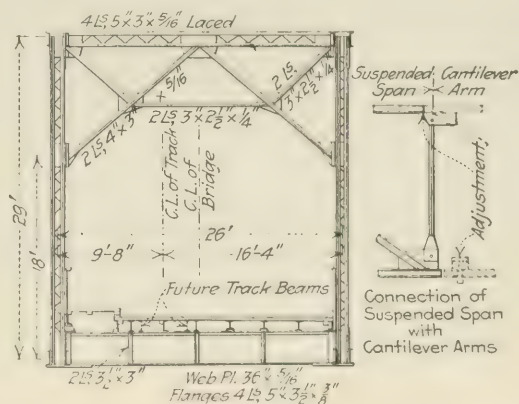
CROSS-SECTION AND DETAIL OF BRIDGE
